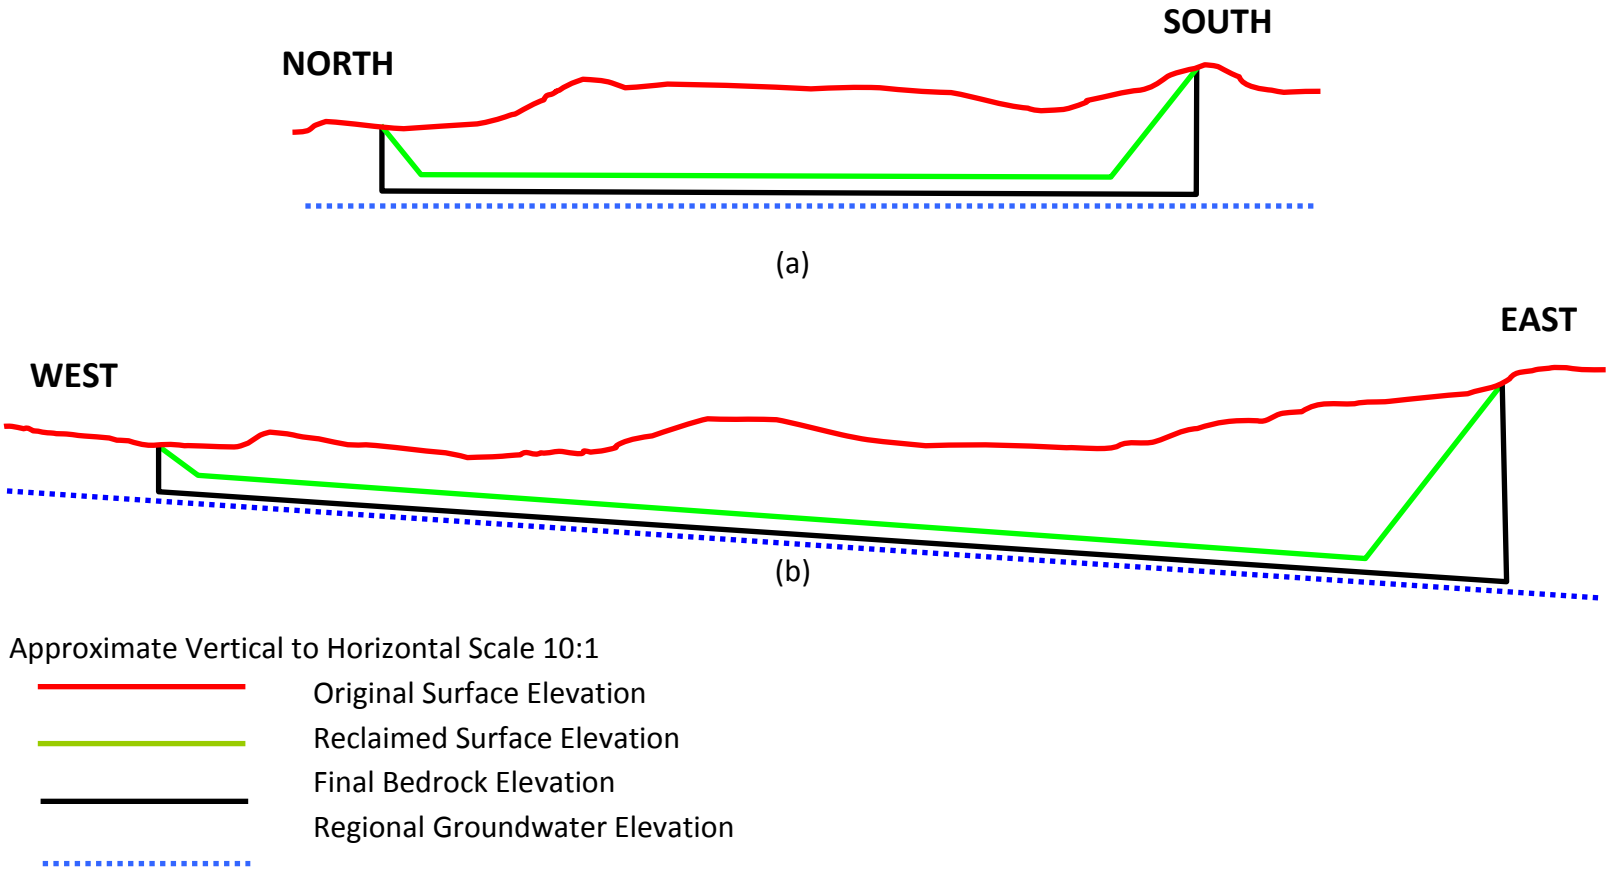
Cross sections of the Douglas Township Quarry (a) north-south cross section, (b) East-west cross section.
